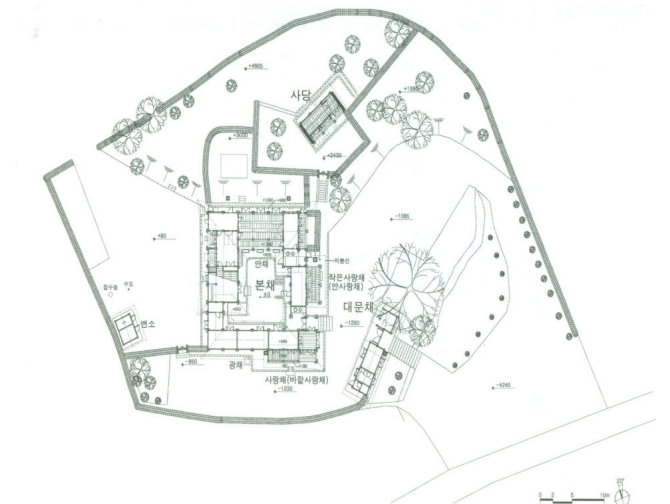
Site plan of General Lee Sam's old house¹³⁾
